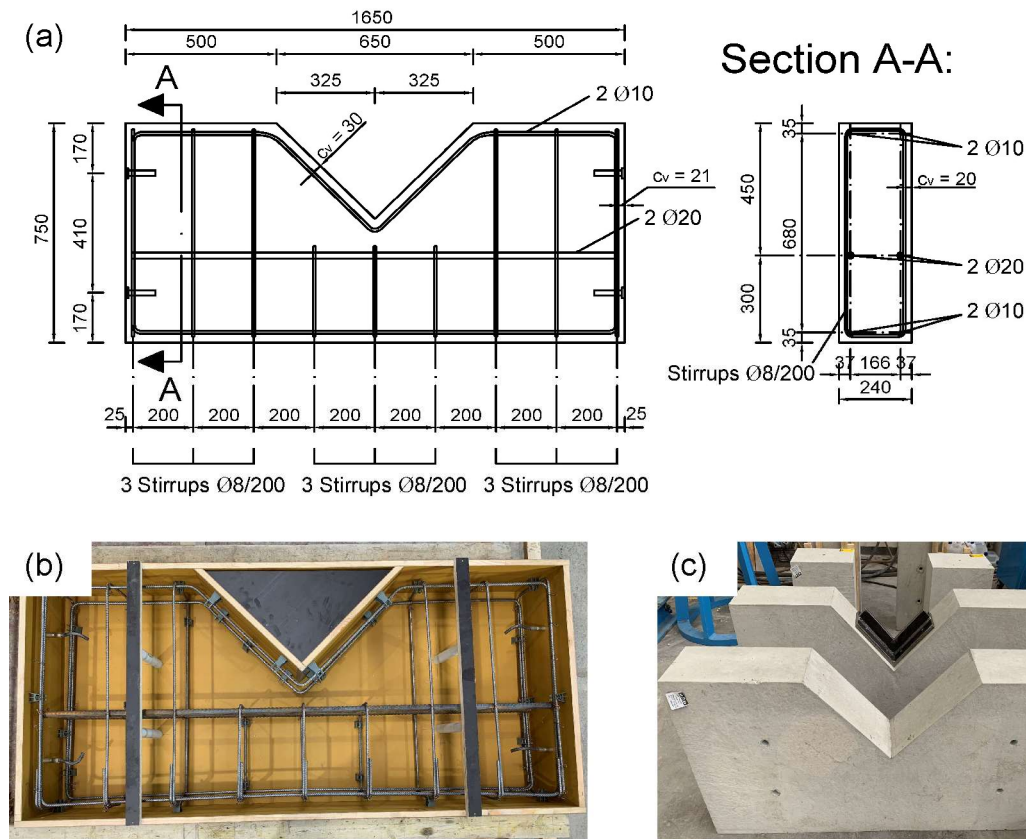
(a) Dimensions and reinforcement details of the concrete specimen used in the experiments, (b) formwork with reinforcement cage and (c) concrete specimen after construction. (Note: All dimensions are in mm).
